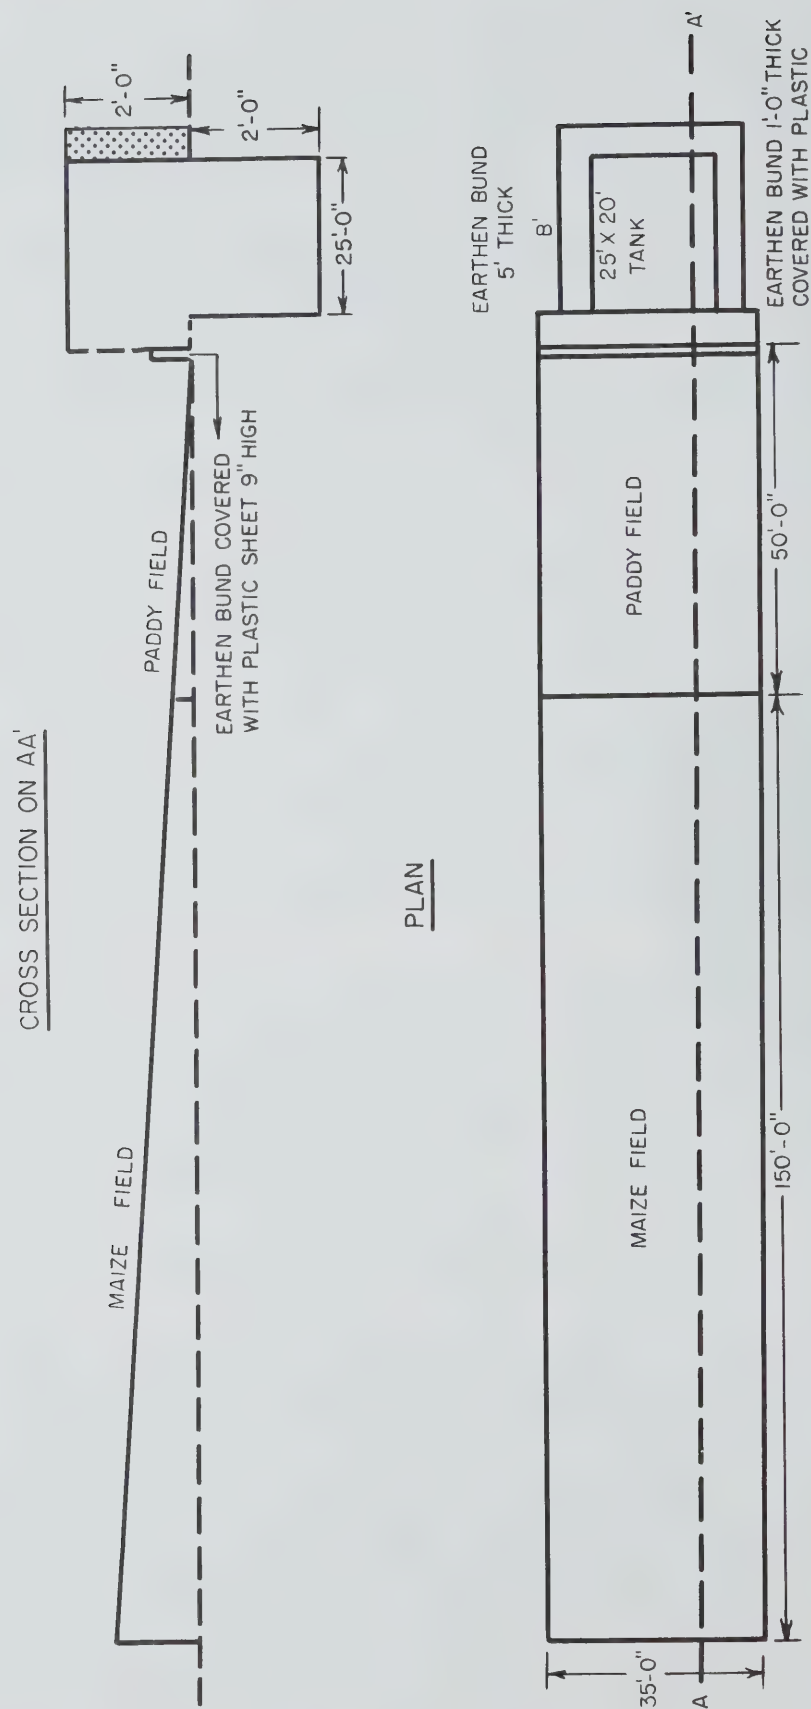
Plan of fields used in water harvest and surface drainage experiment.
